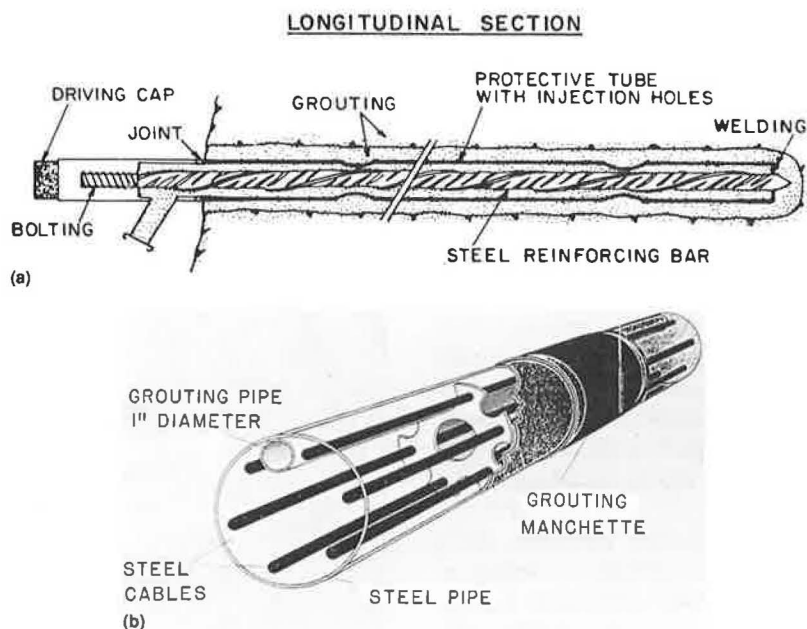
TBHA nail developed and patented by Solrenfor for permanent structures (a) and prestressed multireinforced nail, Intrapac, developed by Intrafor-Cofor (b).
